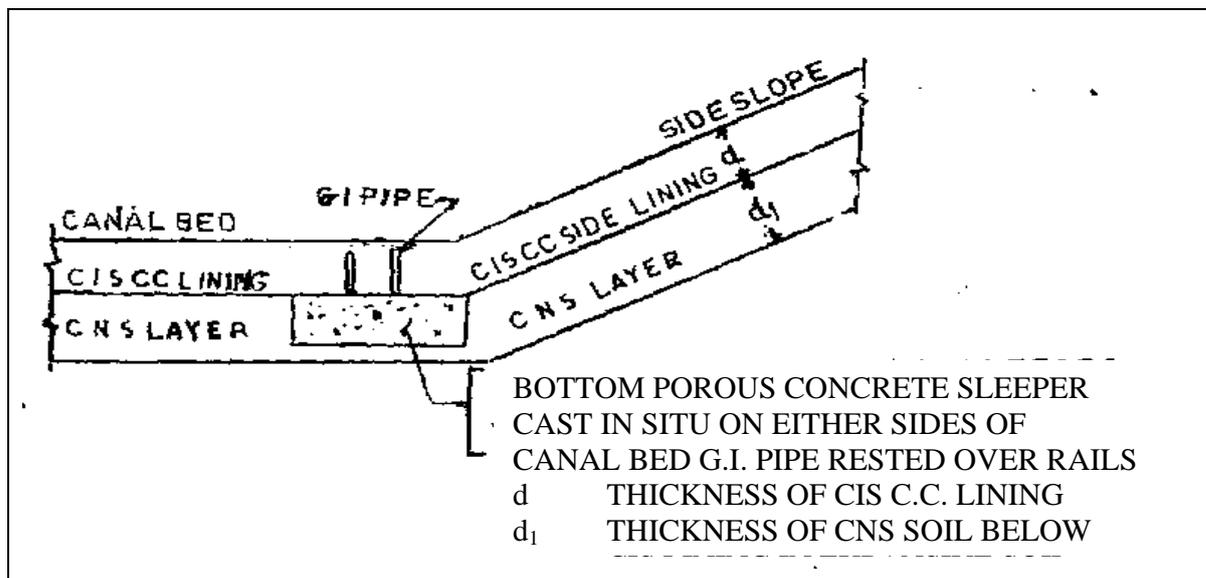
ILLUSTRATORY DETAIL OF BOTTOM RAILS
